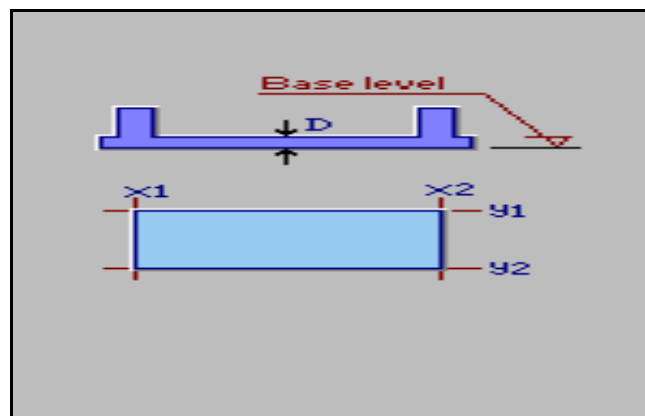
Section in Mat Foundation (STA4-CAD Handbook)
